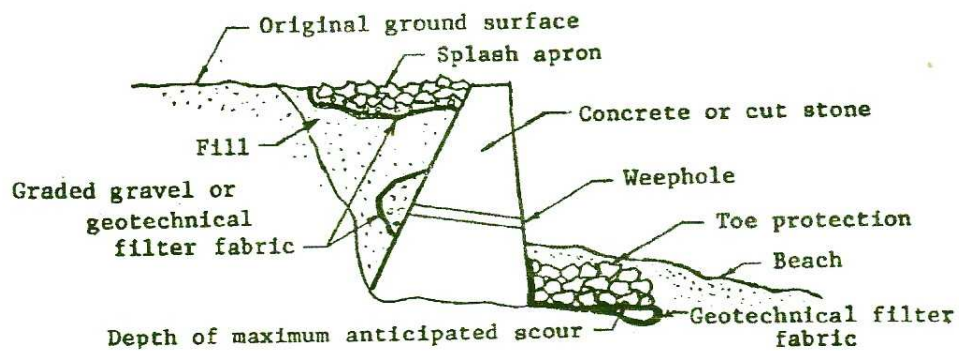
Concrete or masonry seawall (U.S. Army Corps of Engineers, 1981)
